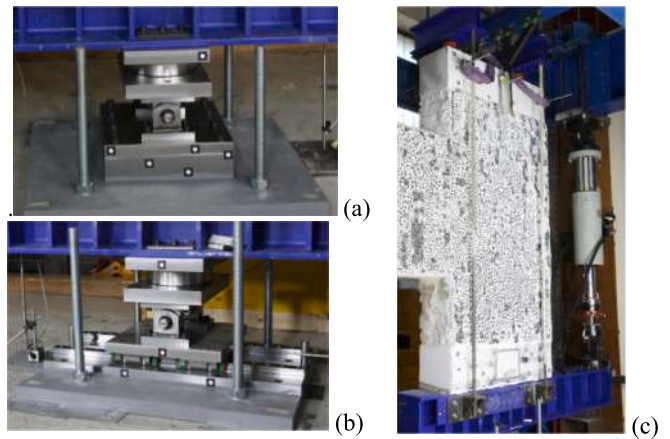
Details of the testing apparatus: (a) left and (b) right supports and (c) vertical clamping of a pier.
